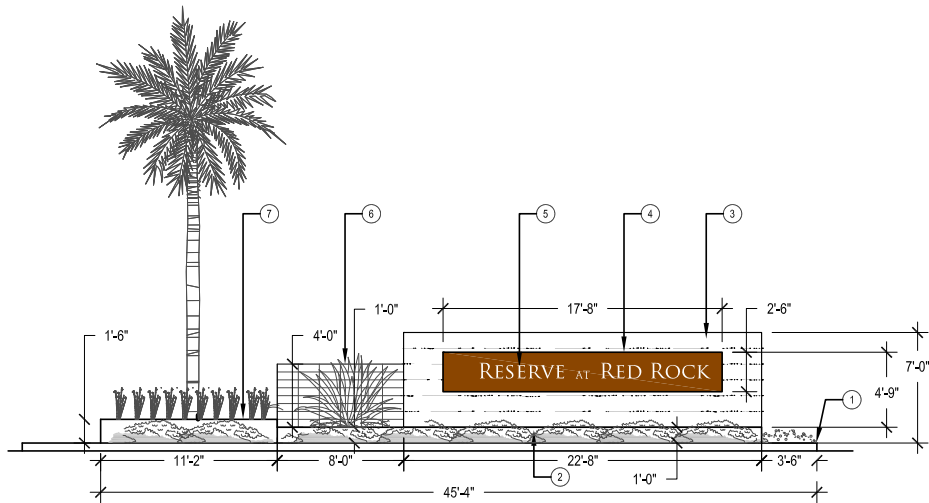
| CONCEPTUAL SIGN ELEVATIONS
